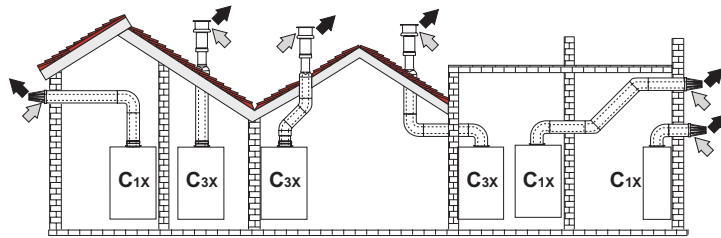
Examples of connection with coaxial pipes (→ = Air / → = Fumes)
